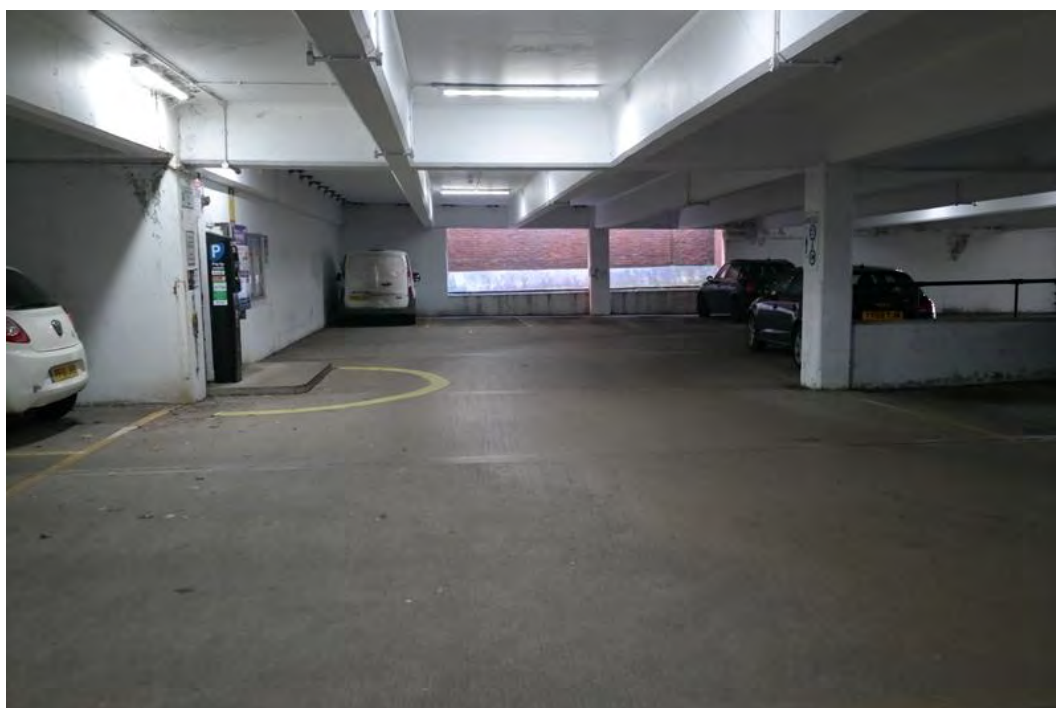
The pay station on the ground floor of the two-storey car park, facing north
